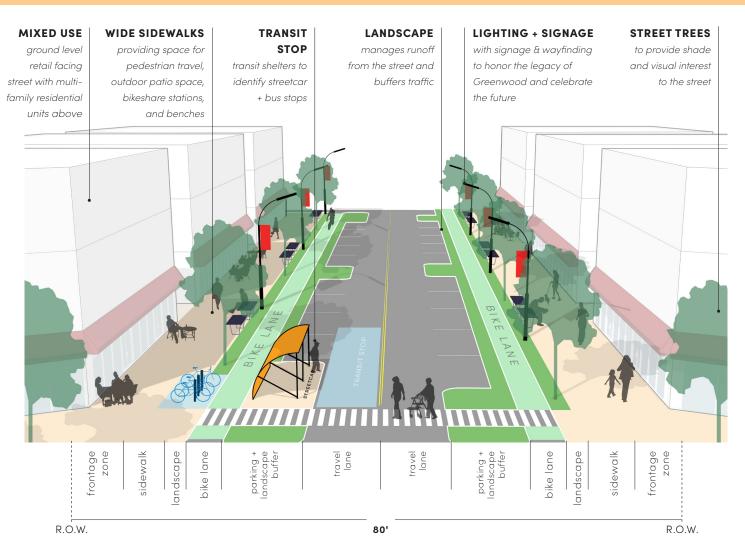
MAIN STREET CONCEPTUAL STREET SECTION
